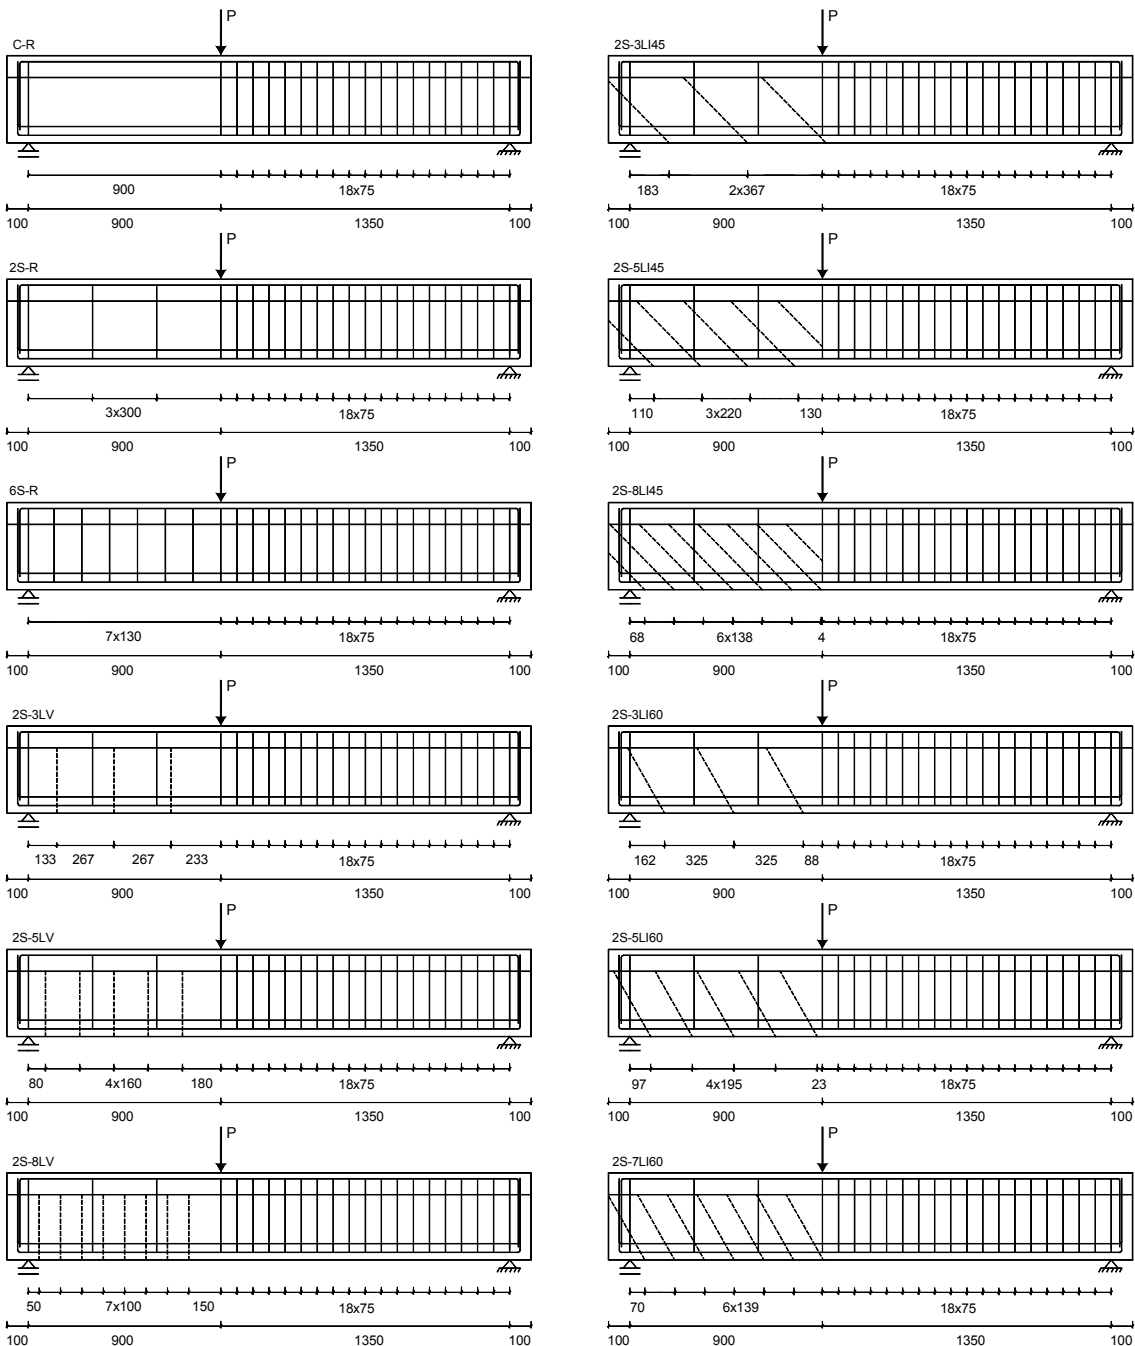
Tested beams: localization of the steel stirrups (thick line) and CFRP laminates (dashed line).
